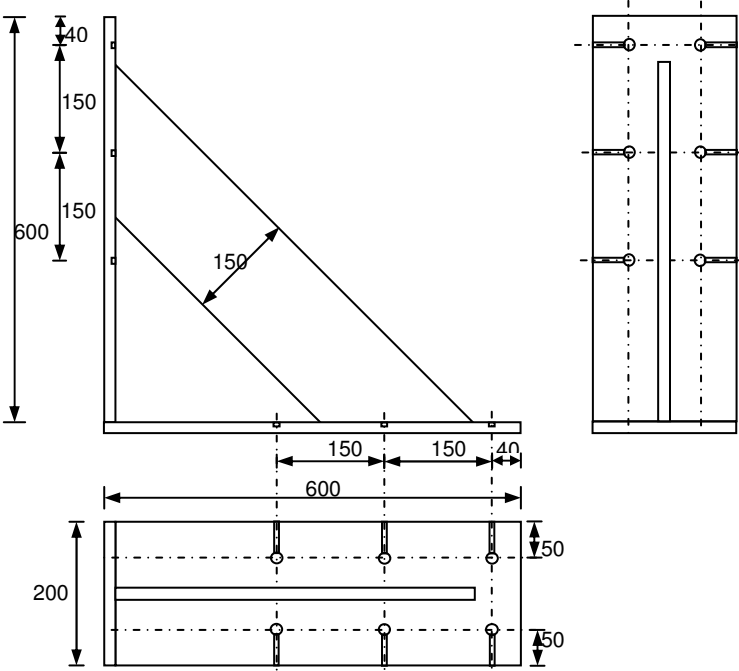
Trial haunch element for retrofitting of joint at 2nd floor grid B-2
